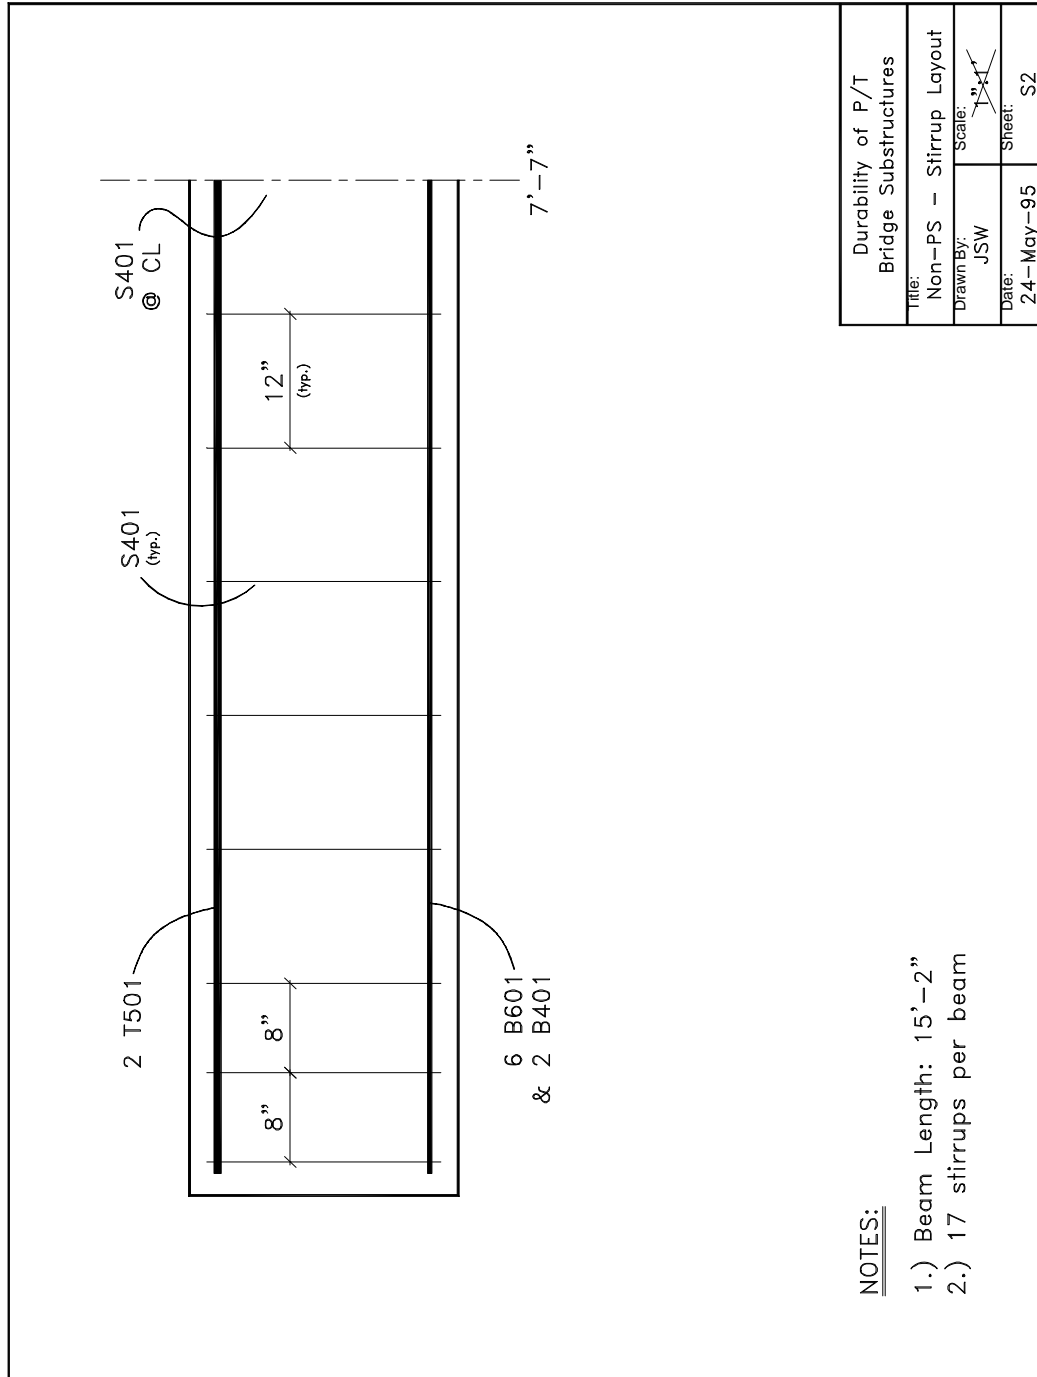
Sheet S2: Non-PS Stirrup Layout
